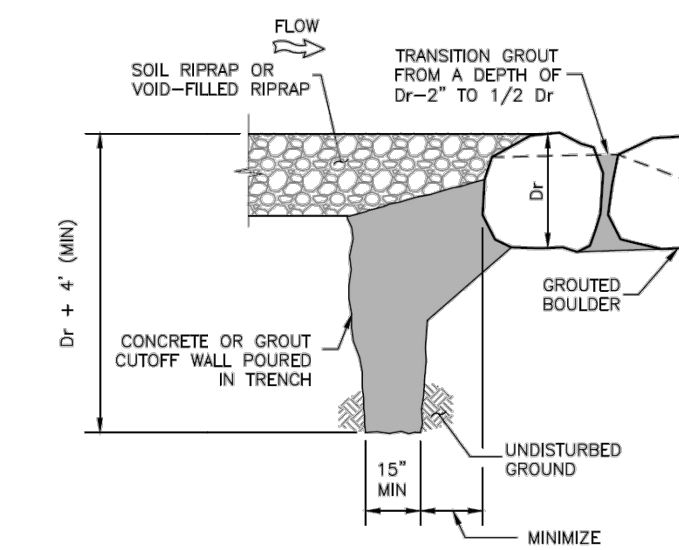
Concrete or grout cutoff wall upstream of drop structure
